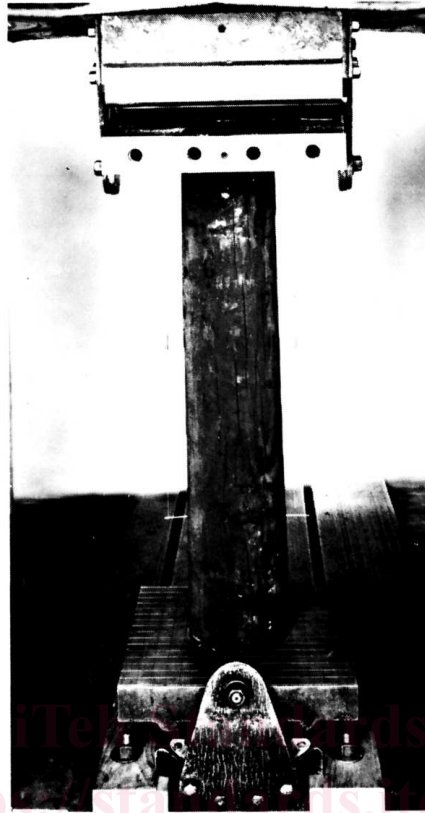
Example Test Setup for a Short Specimen Compression Parallel to Grain Test (Two Bearing Blocks Illustrated)
